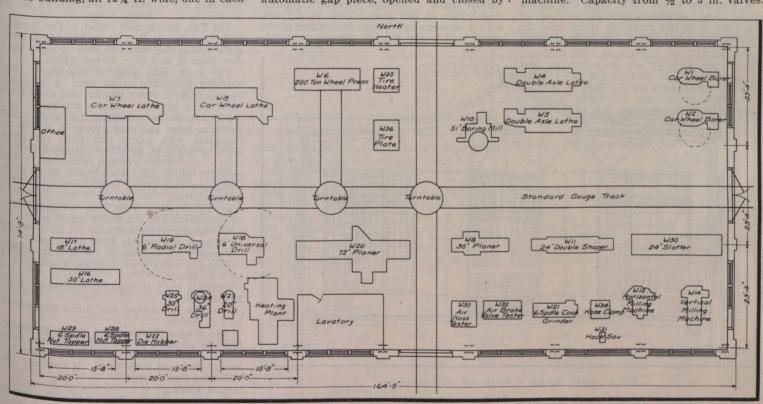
Plan and Machinery Location of Wheel and Machine Shop.
